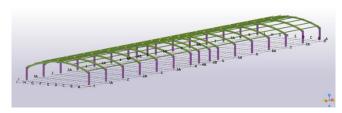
3D Model of Steel Roof Structure in Tekla Structures
